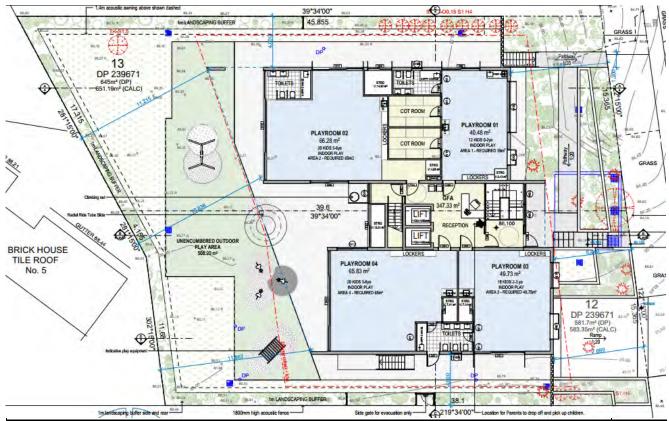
Extract of proposed ground floor plan. Source: Designcorp Architects, 25 June 2020
